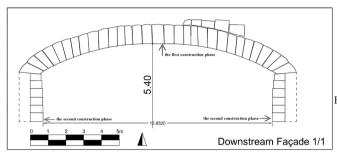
Front View Drawing of Downstream Façade (Drawing: İlkay Göçmen).
